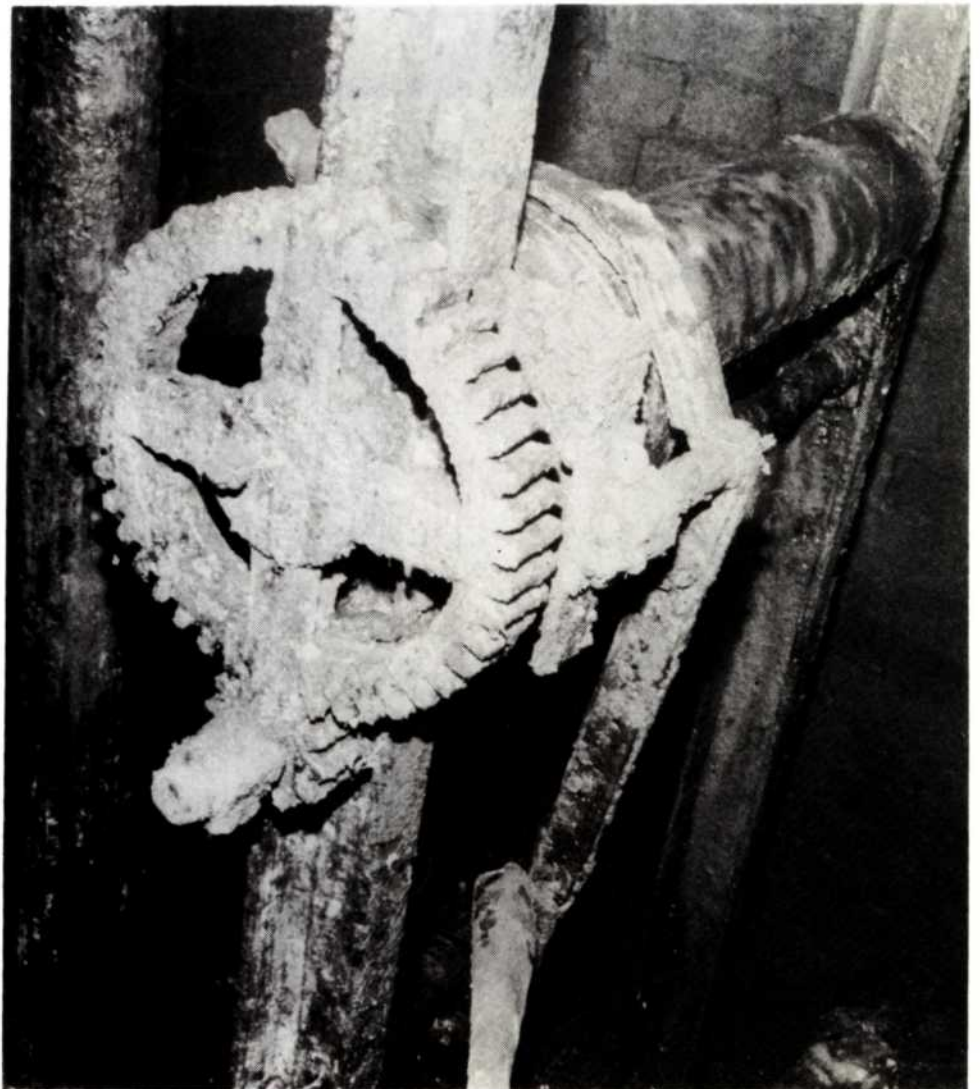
Winch Showing Gear Drive, Ratchet and Brake Band
